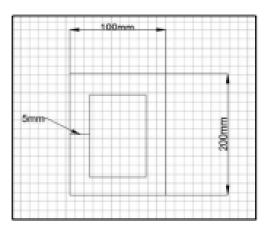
shows the Steel Tube Beams Dimension (Front View)
